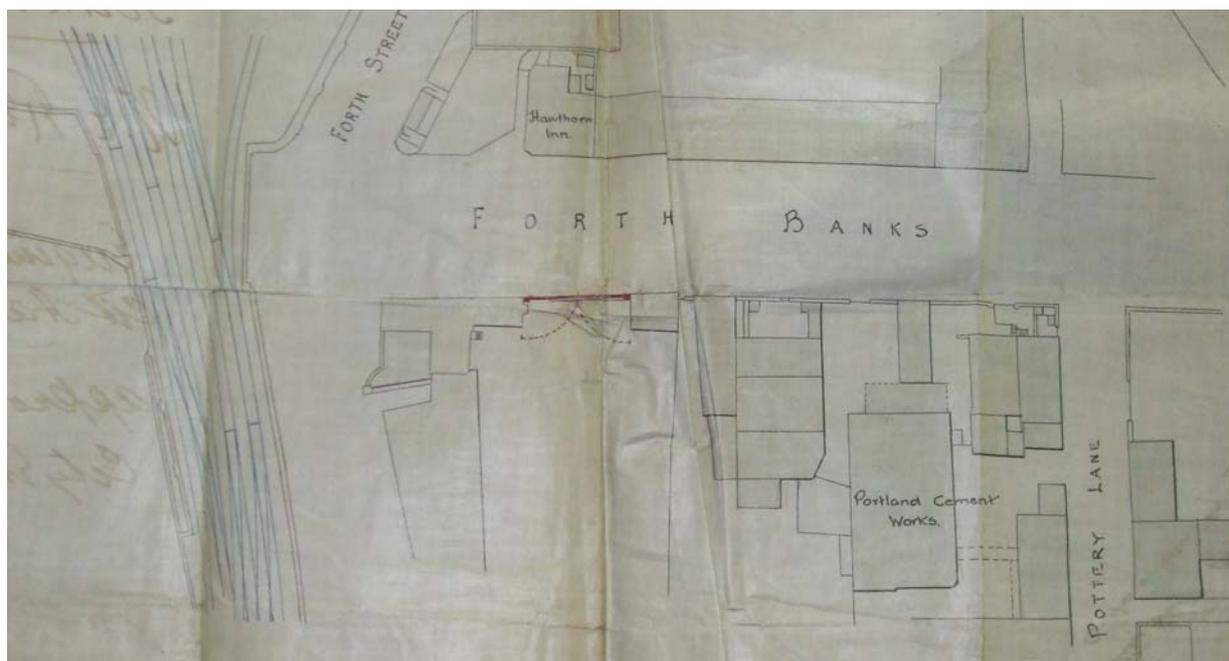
Plan dating to 1902, detailing the former brewery buildings as 'Portland Cement Works'
